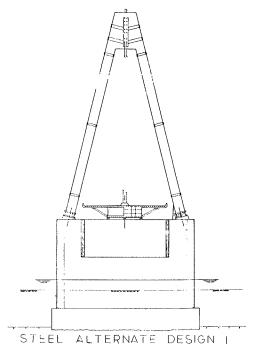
Typical cross section of cable-stayed bridge at pier 5 (design 1).
